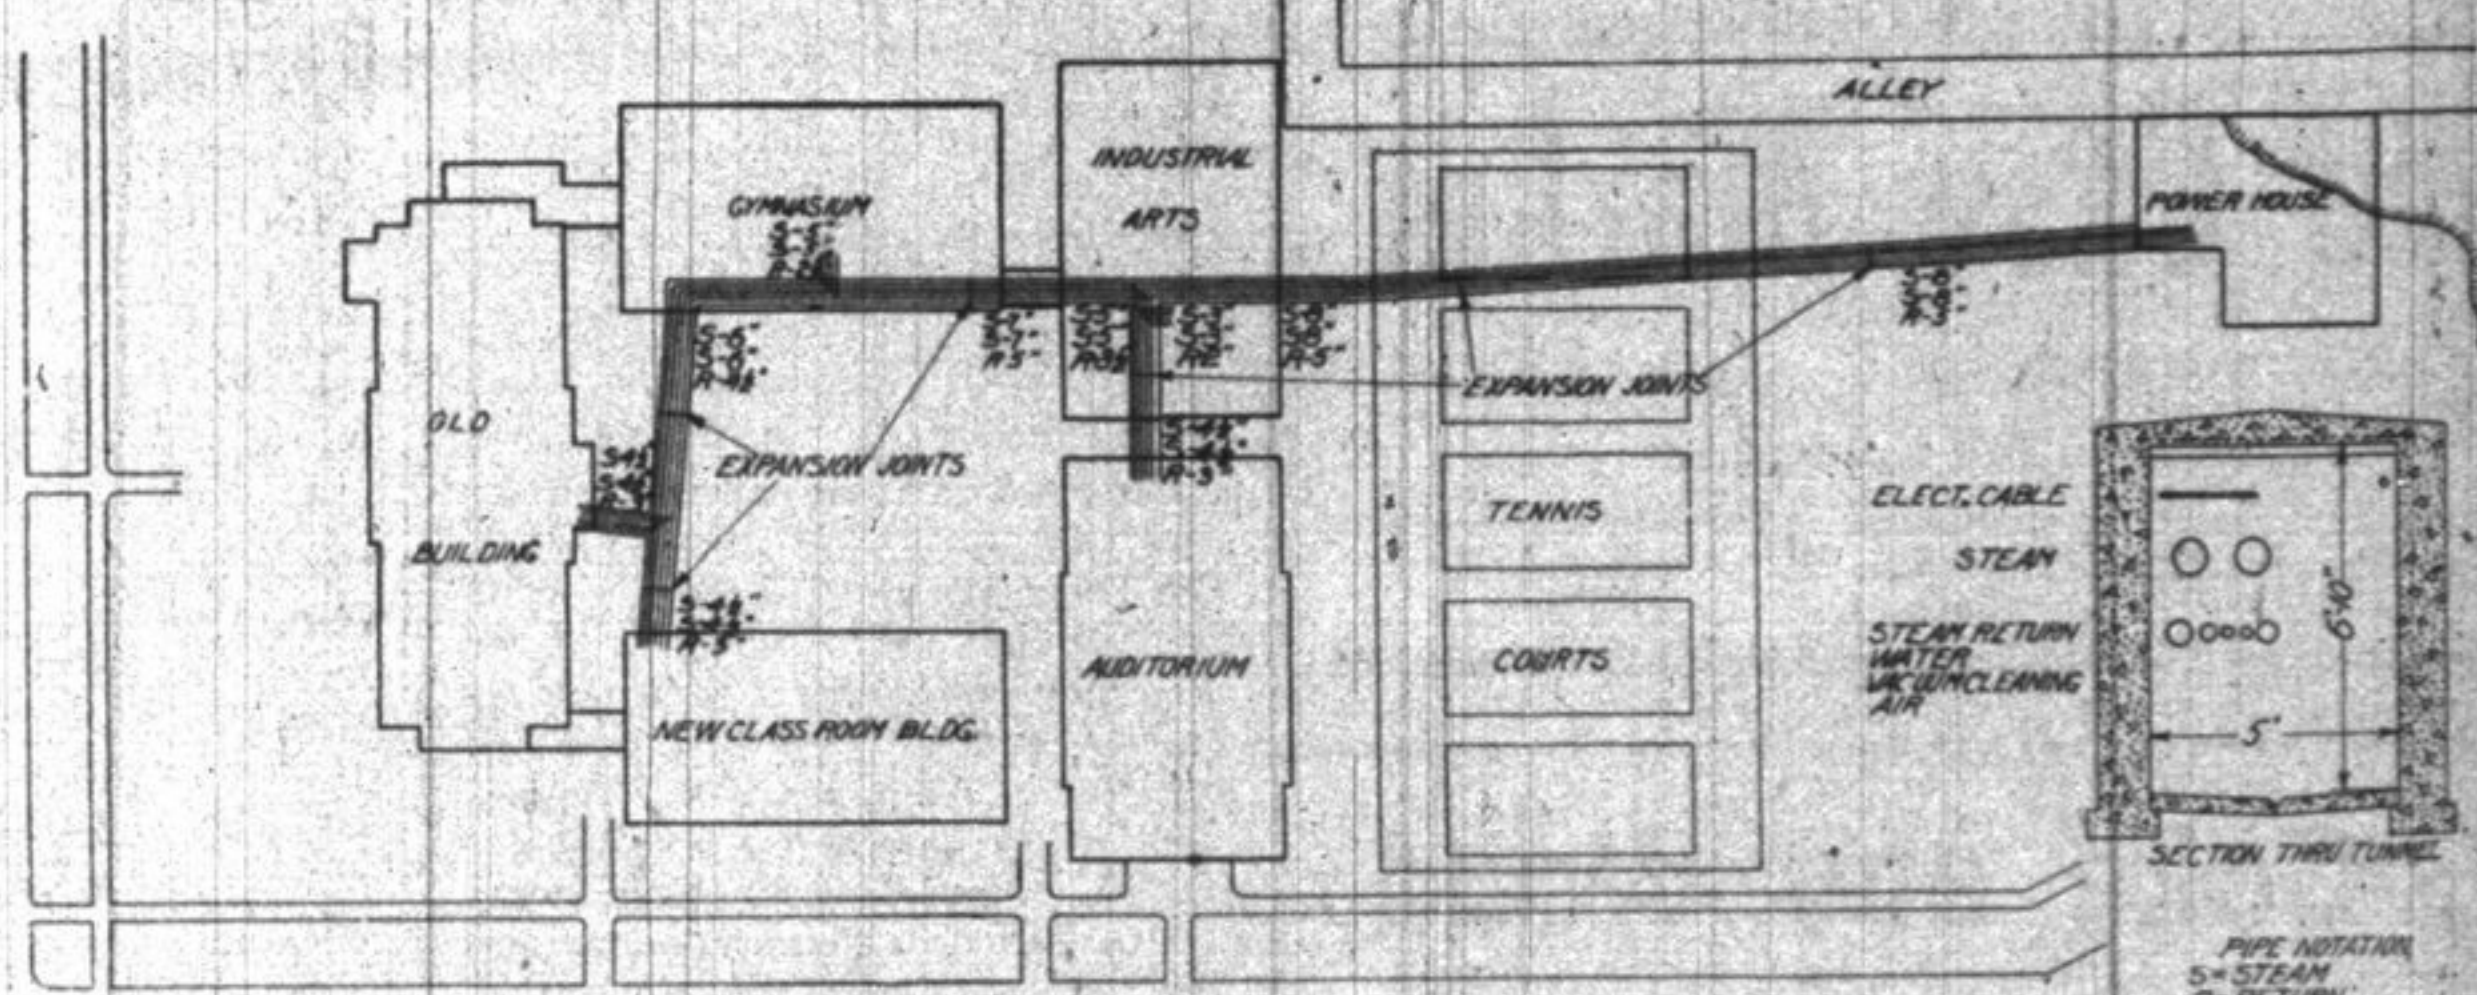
GENERAL LAYOUT OF BUILDINGS AND TUNNEL SYSTEM
